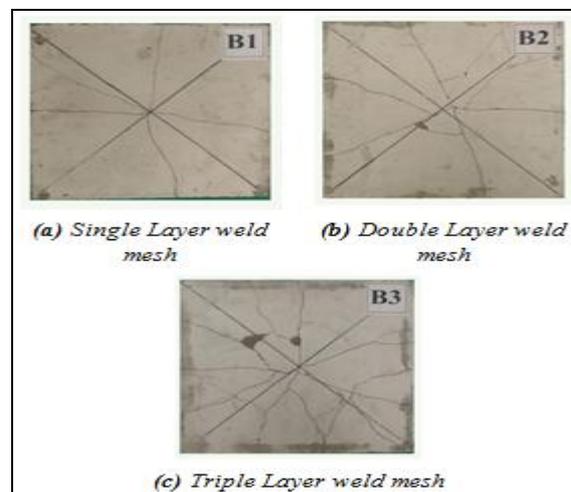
Failure Pattern of Ferrocement slabs with addition of 10% Fumed Silica
